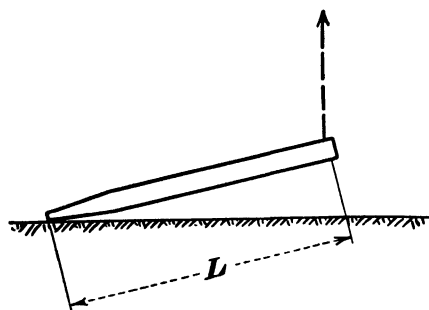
Precast reinforced-concrete piles have to be designed to resist stresses caused by their own weight during transportation prior to driving. (From Ref. 272.)
